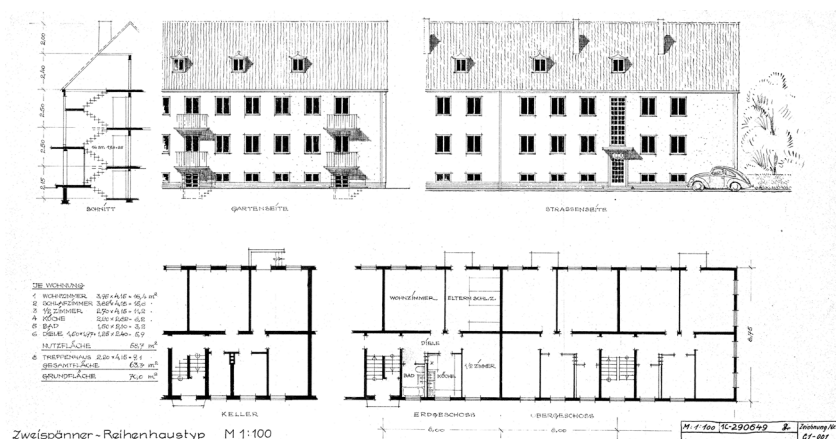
Bremer Wirtschaft Wiederaufbau M.B.H., Housing blocks, 1949. Elevation and plan views (Eduardo Torroja's archive).
